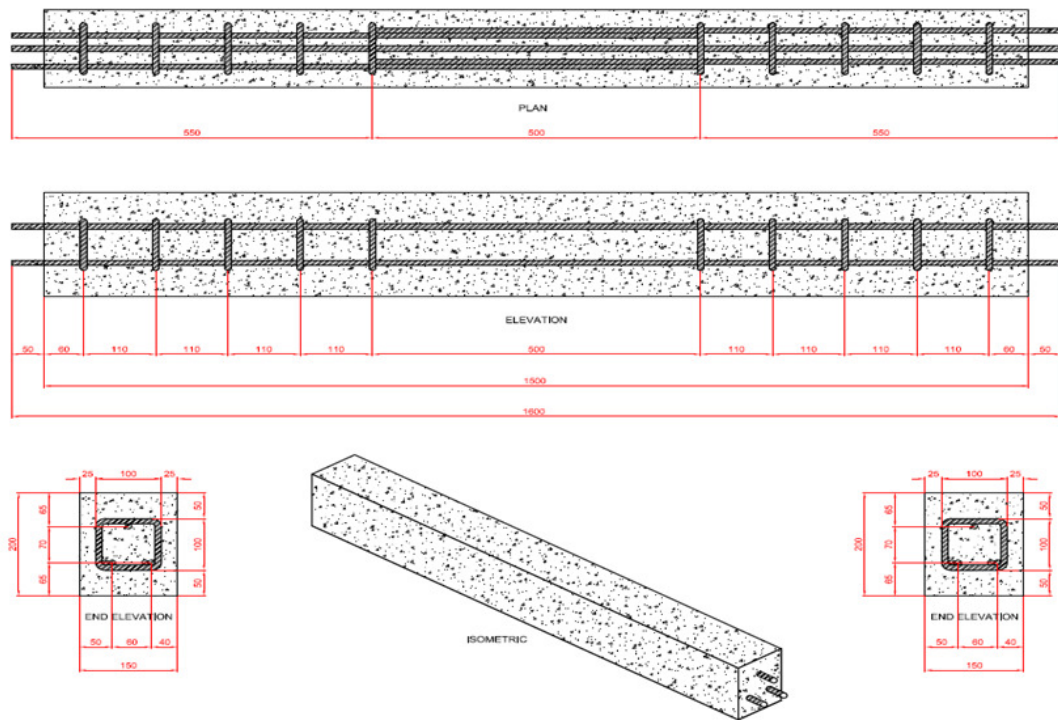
BEAM SET B DETAILS (ROBINSON, 2013)
